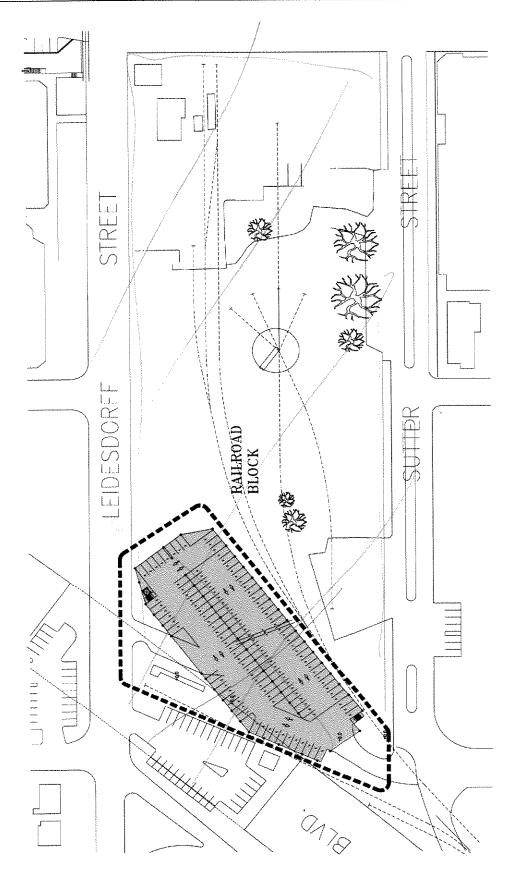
Railroad Block Parking Structure Site Plan - Option A
